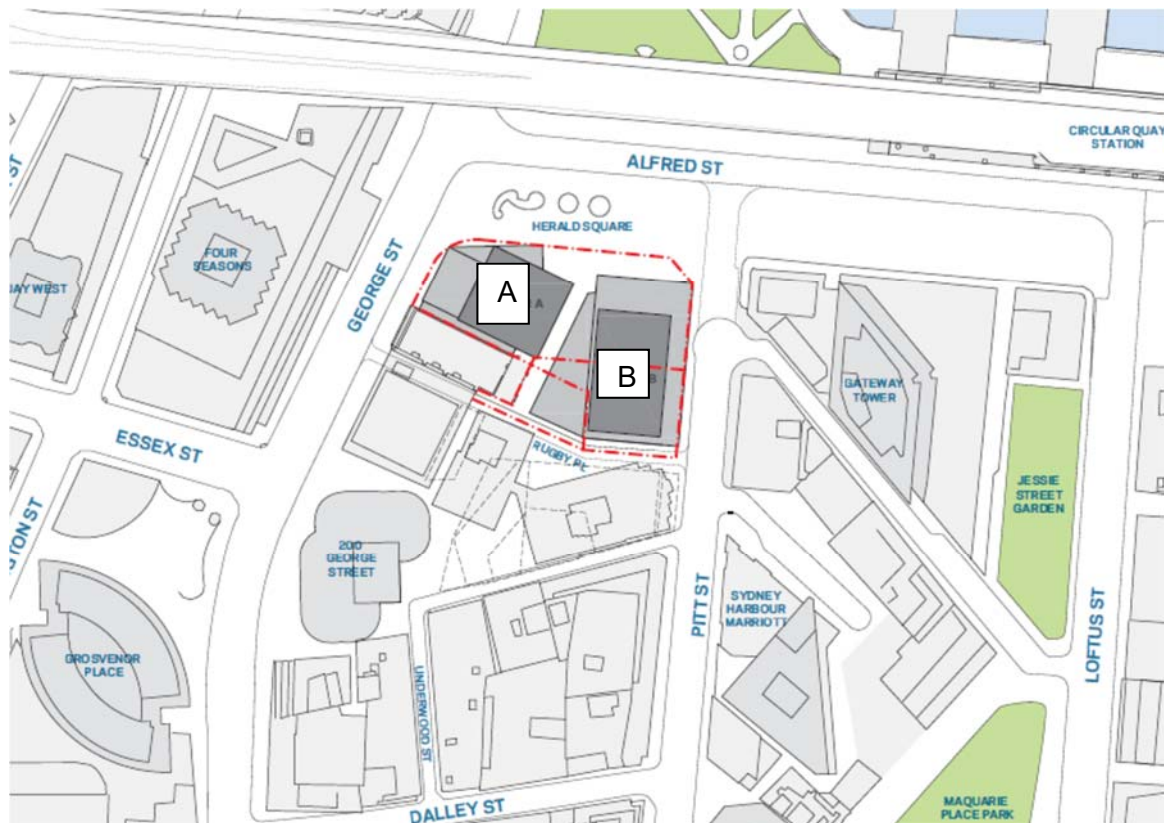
Approved envelopes of Tower A and Tower B within Wanda One Sydney site
